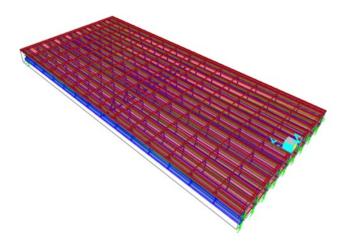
Model. CSIBridge model of Span 14 of Bridge11B of the I-16 I-75 Interchange project with prestressed girders
